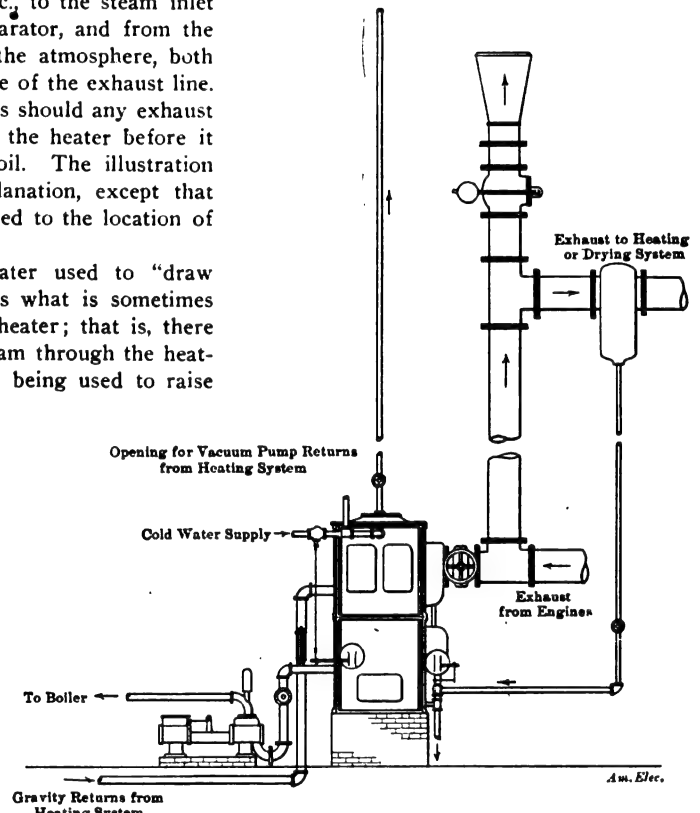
SIMPLEST METHOD OF DRAWING THE SUPPLY AND BY-PASSING THE HEATER.
